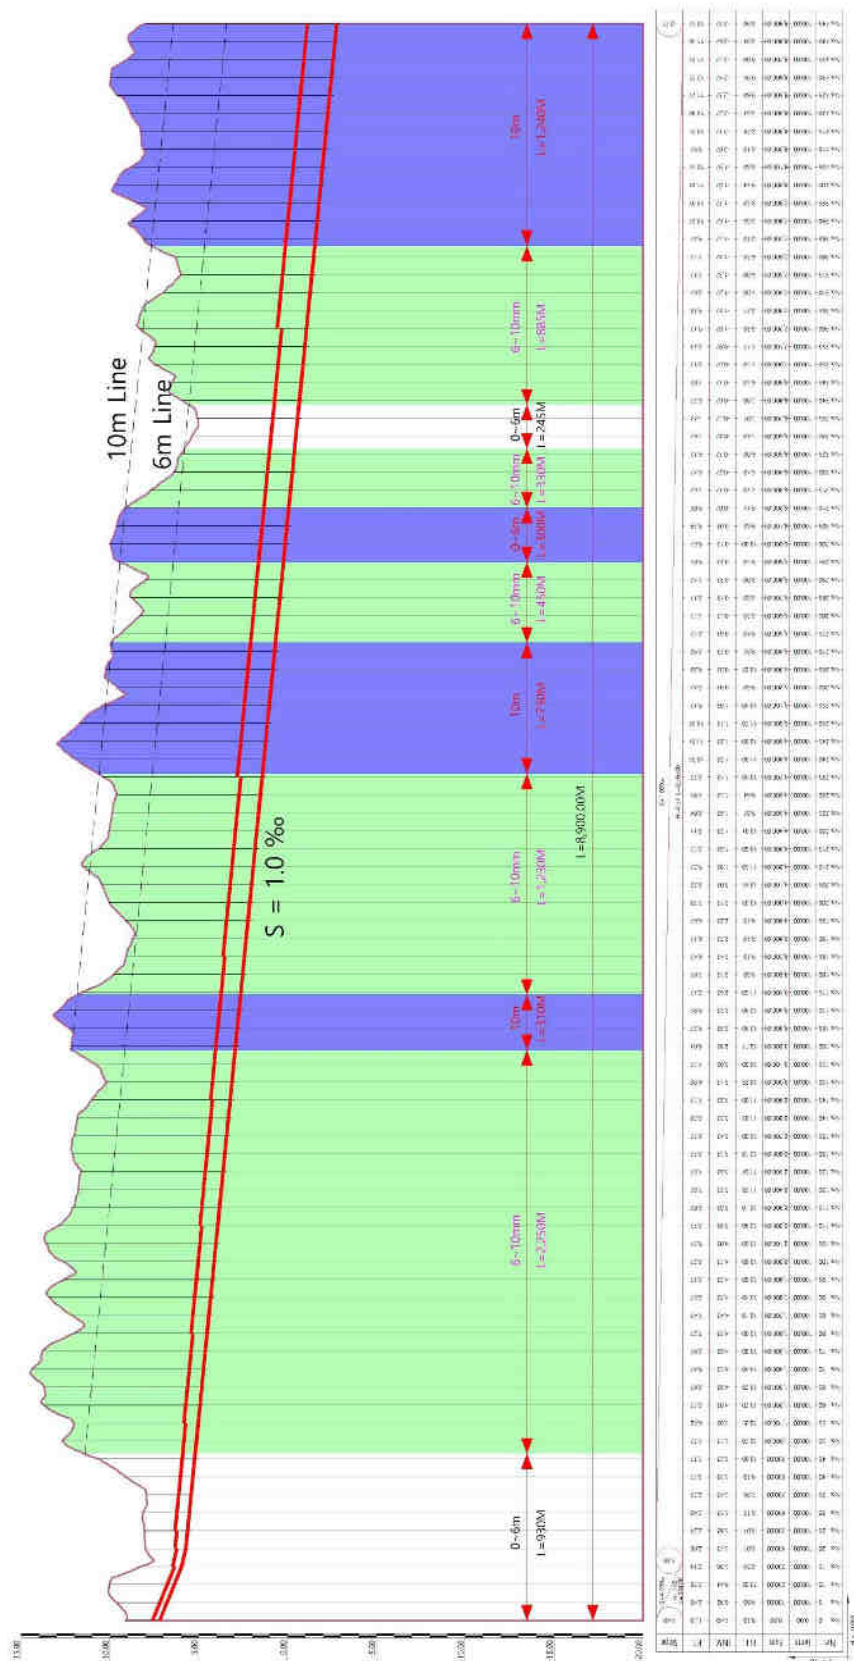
Longitudinal Plan for Trunk Sewer Pipe
